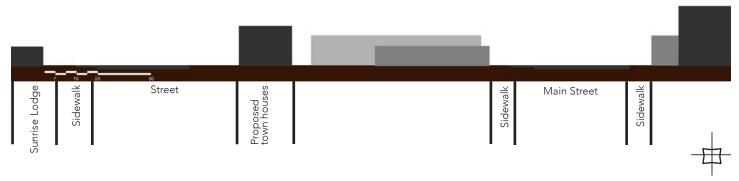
At street level looking south, town houses are to scale with Arborg's existing infrastructure
